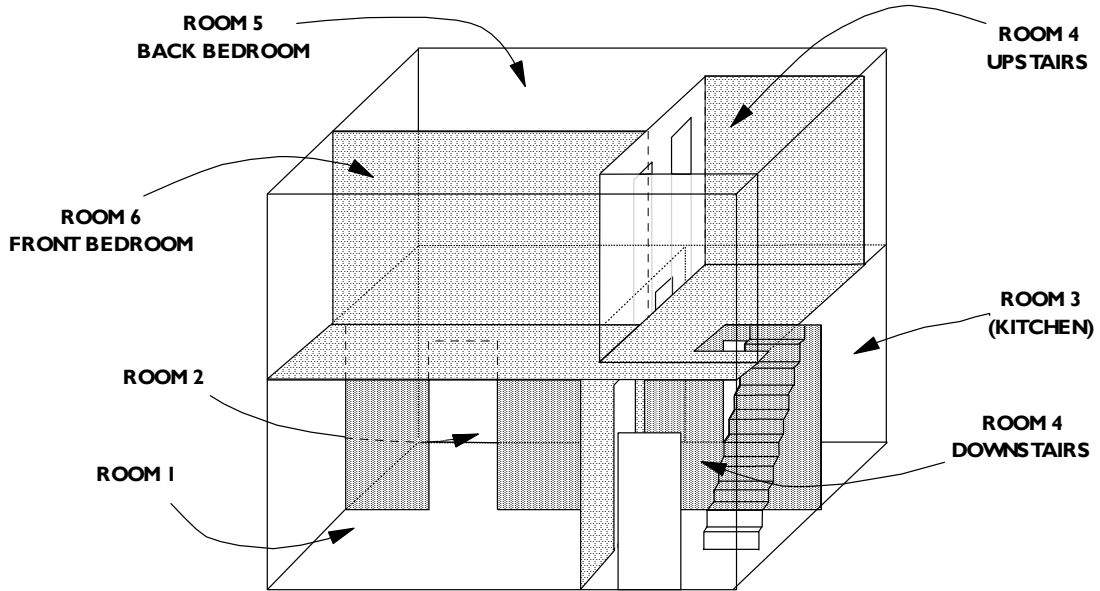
Schematic Layout and Nomenclature of Rooms in the Test facility
